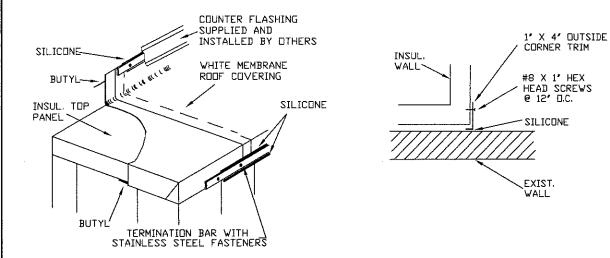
DETAIL-SECTION BETWEEN ENCLOSURES WITH INSULATED SLABS
